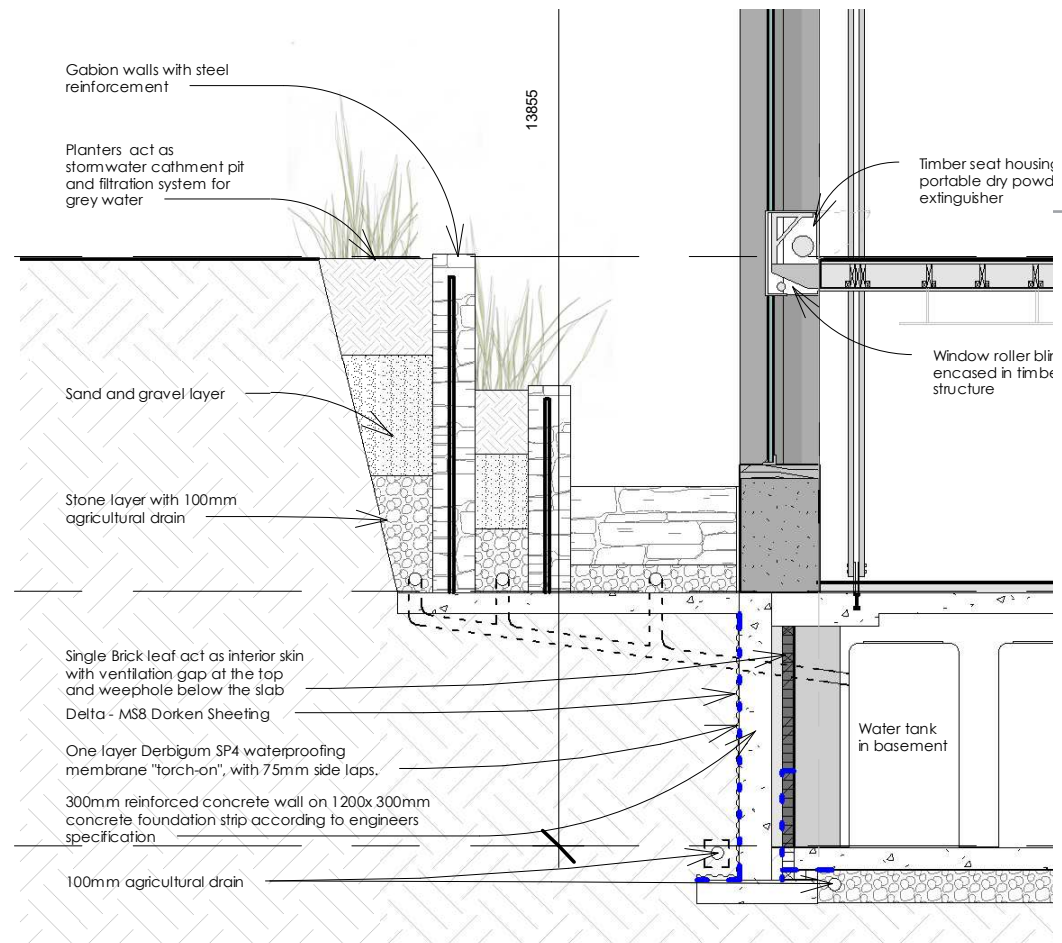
Section AA Detail of Bioswales and Stormwater Treatment
